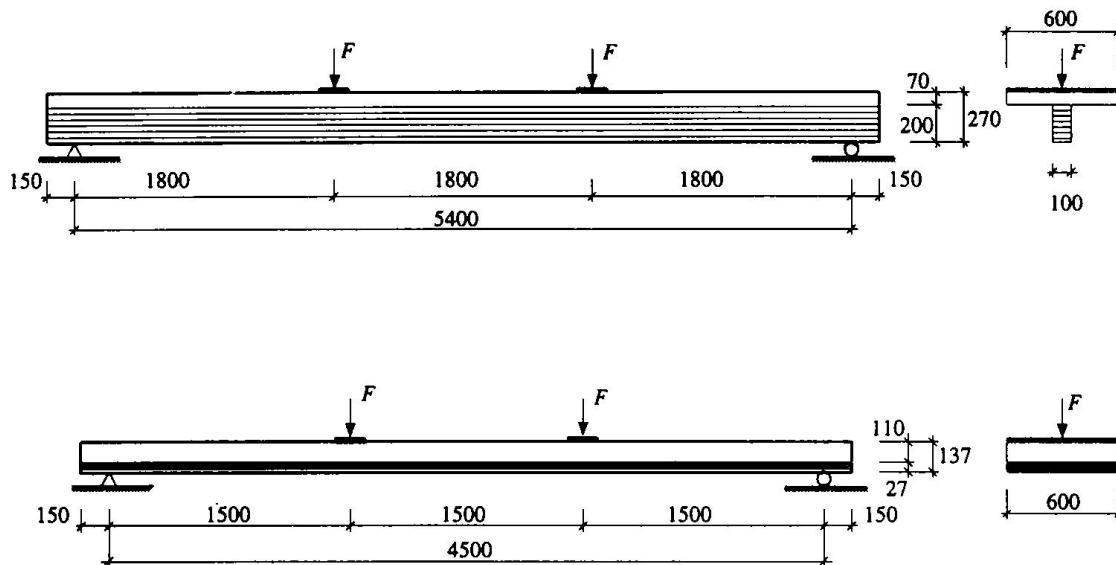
Test specimens for timber-concrete composite beams. Connections are screws, punched metal plate fasteners, grooved connections with dowels (top), and grooved connections in LVL (bottom)
